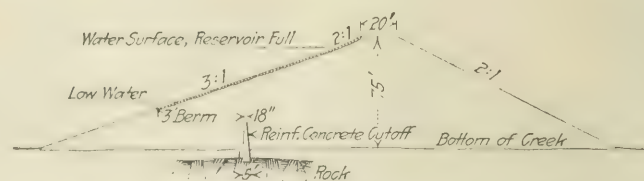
CROSS-SECTION OF SANGUIJUELLA EARTH-FILL DAM FOR LAS VEGAS IRRIGATION PROJECT
